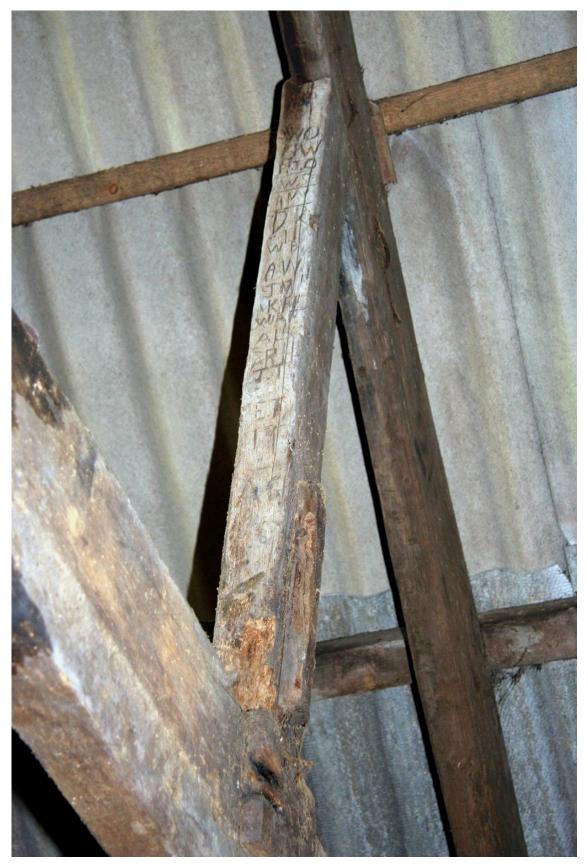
Graffiti on a roof truss in Building 1 It appears this was periodically added by individuals who were oiling the line shaft bearings mounted in the roof structure
